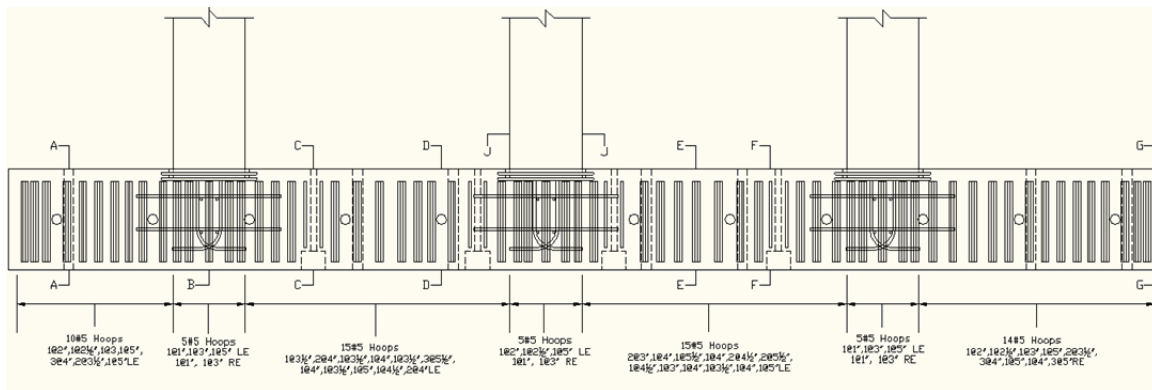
Footing Reinforcement - Three Pile Specimen
